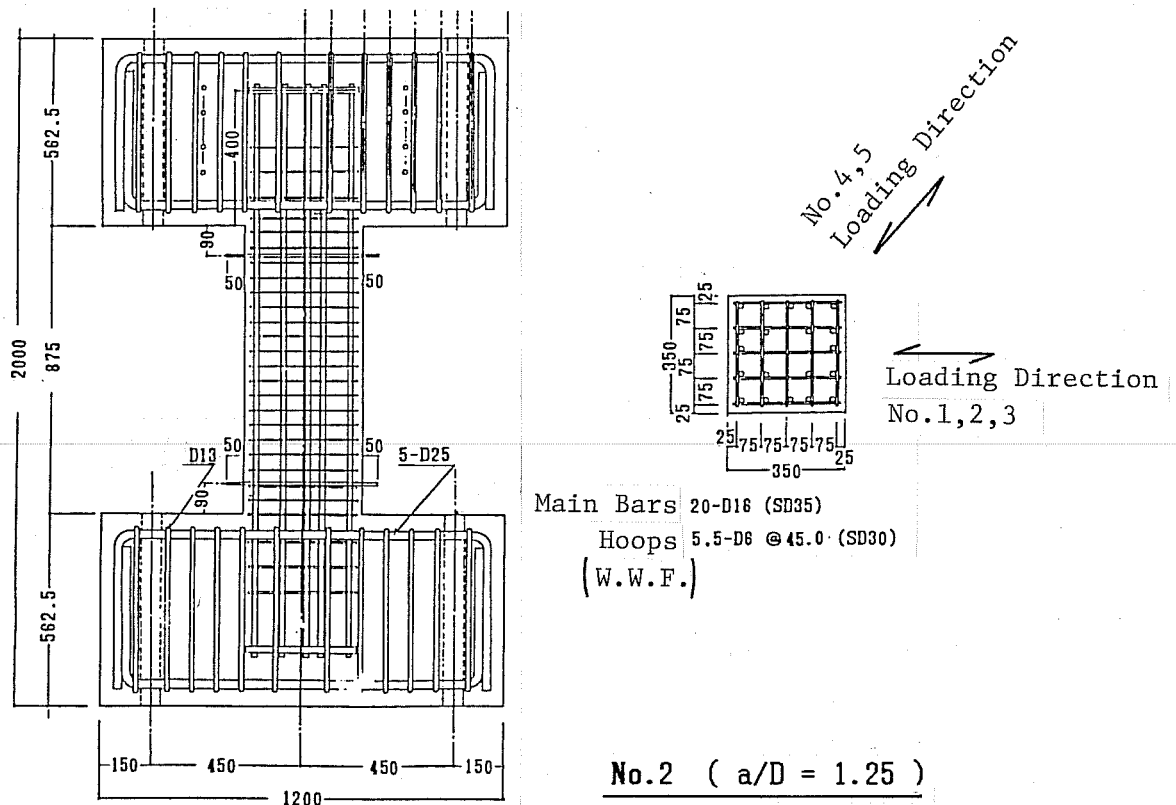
Details of Column Specimen for Simulated Seismic Loading Test (Series-II)
